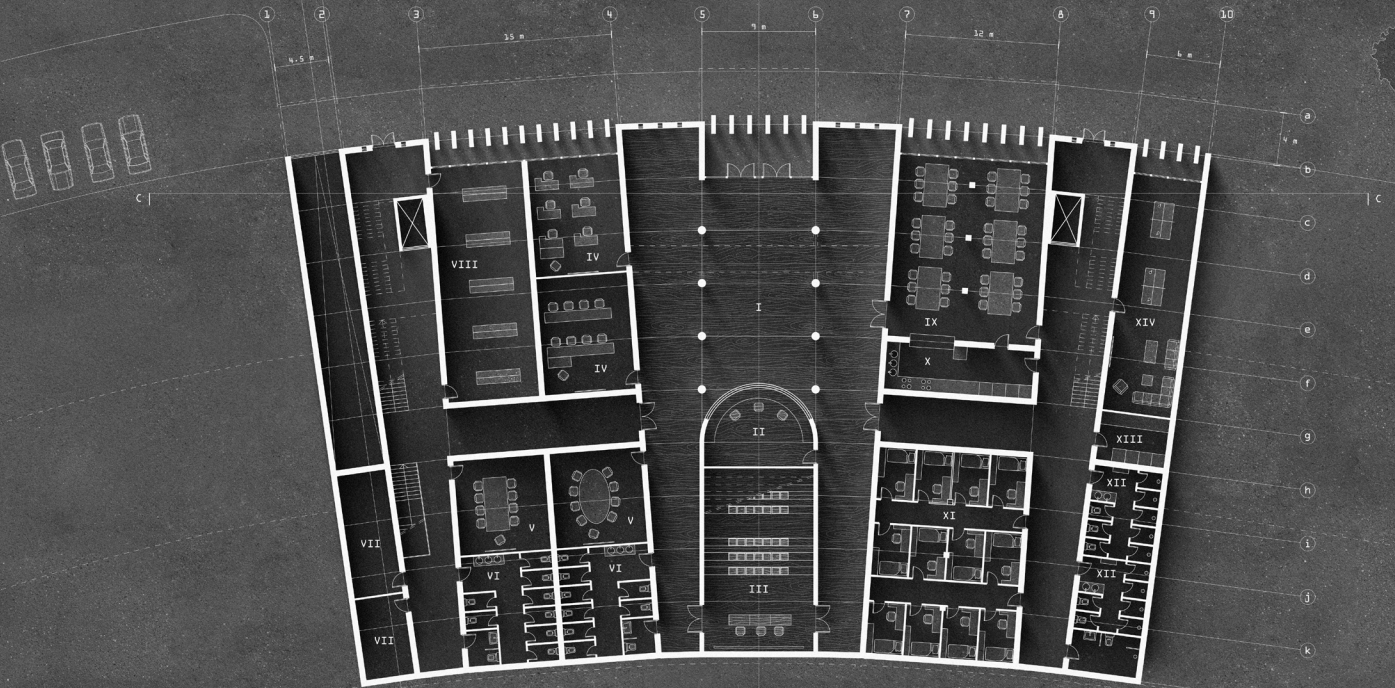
Floorplan ground floor, pre- conflict. 1:200
